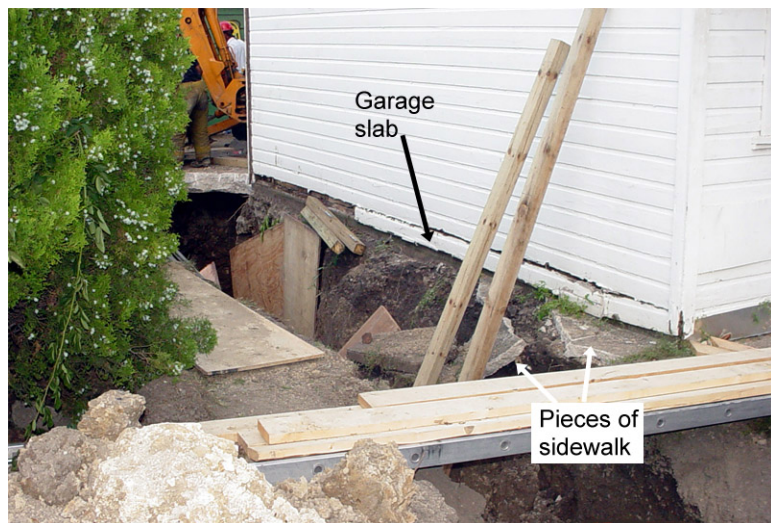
Pieces of sidewalk in collapsed area and garage slab separated from foundation.
